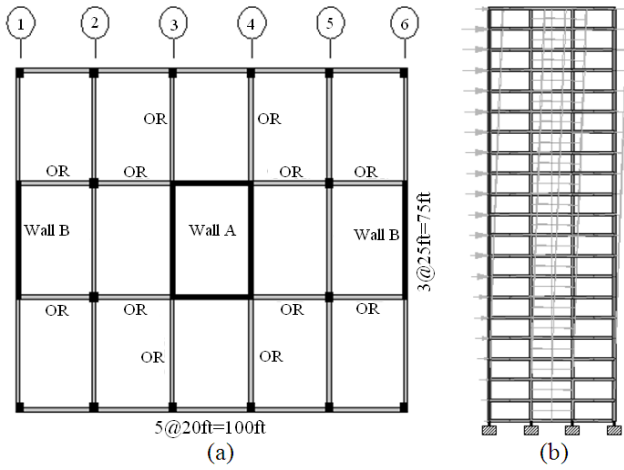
(a) Plan of the tall building. (b) elevation of the tall building with deflected shape due to wind loading.
